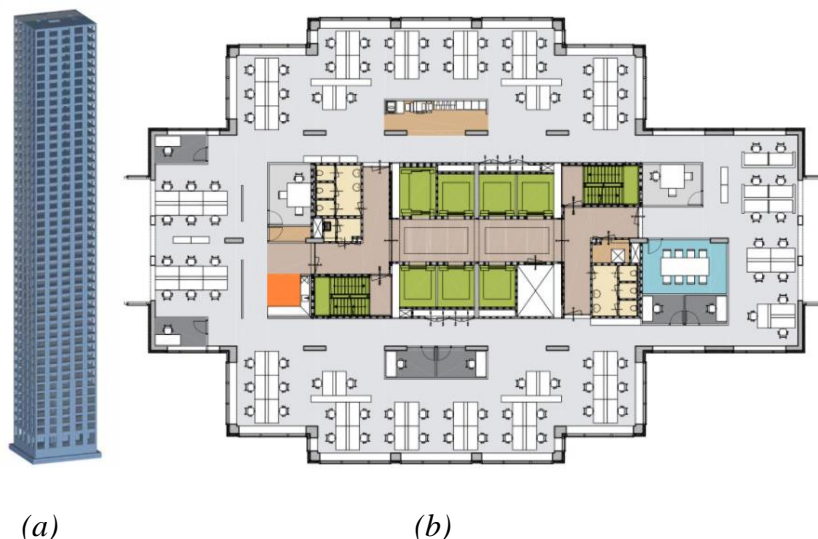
(a): Overview of tube structure Baan tower. Source: Treels [114] ; (b): Floor plan of Mondriaan tower. Source: CBRE [18].
